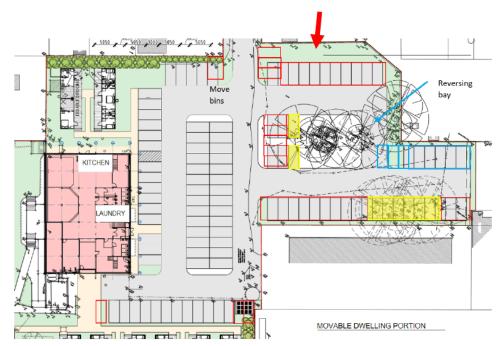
Suggested minor changes to the carpark in order that existing trees can be retained. The yellow area are car spaces proposed to be deleted. It would require 10 car parking spaces to use a reversing bay at the end of their aisle. The red sand blue shapes are slightly relocated space proposed and proposed new car spaces (and the relocated bin area).
